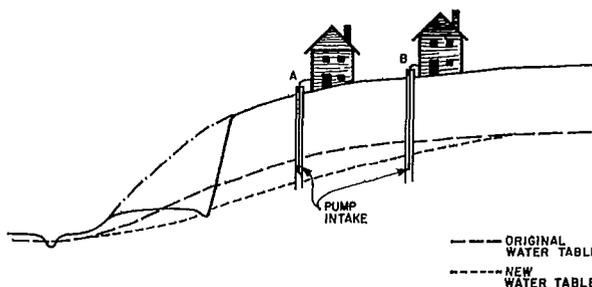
Effects of a road cut. The excavation for a road cut in a hillside intersects and lowers the water table. The new water level in well A is below the pump intake and well A "dries up." In well B the new water level has reduced the column of water over the pump intake reducing the pump efficiency that together with less available water results in lower yield from well B. (Courtesy Arch Associates)
